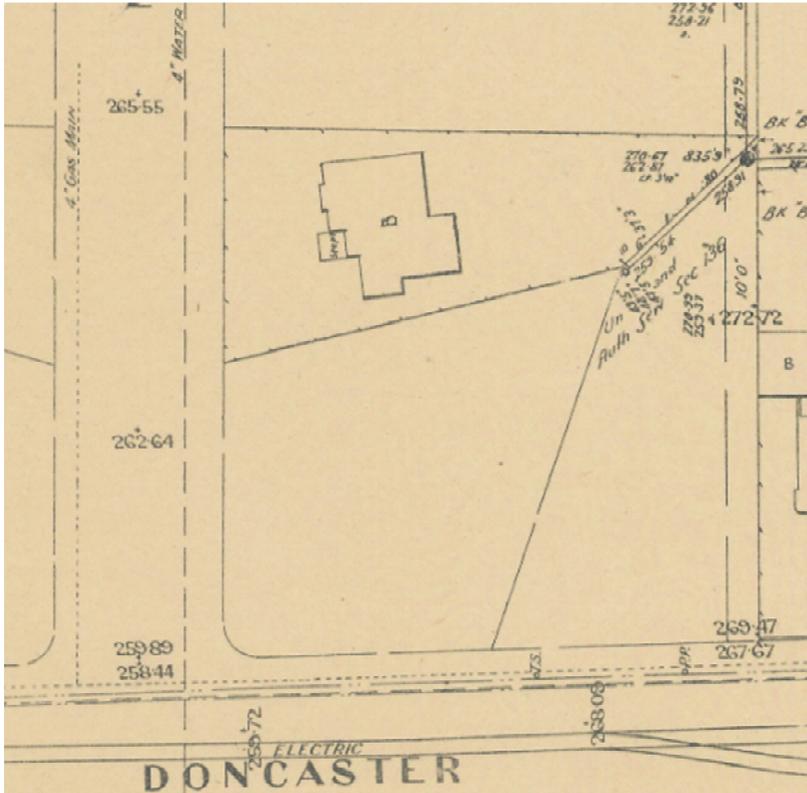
An extract from Melbourne and Metropolitan Board of Works Detailed Plan No. 4846, 1940, showing the newly constructed brick house on site (Source: State Library Victoria).
